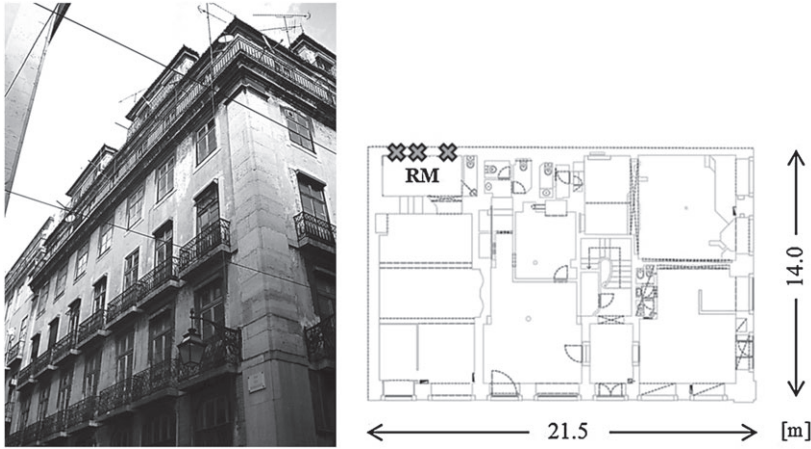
Identification of the “Pombalino” building and the test position on RM walls.
